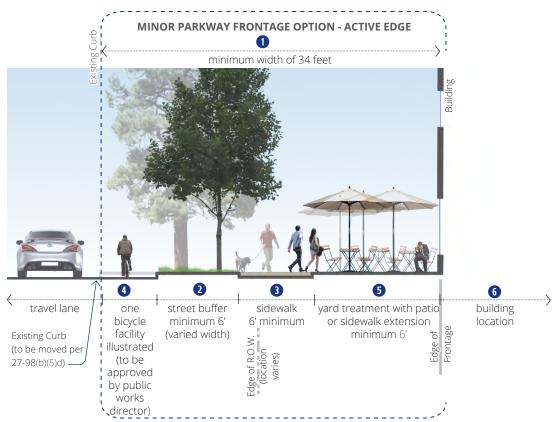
Minor Parkway Frontage Option - Active Edge
